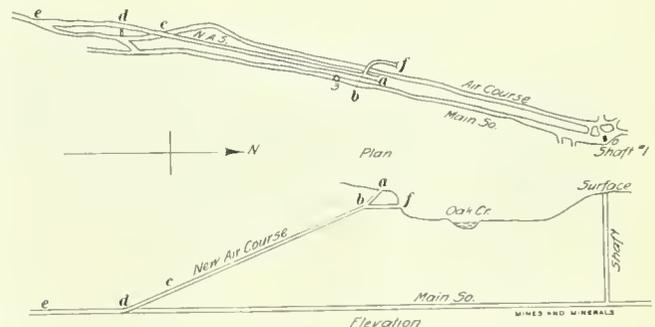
PLAN AND ELEVATION OF AIR SLOPE
